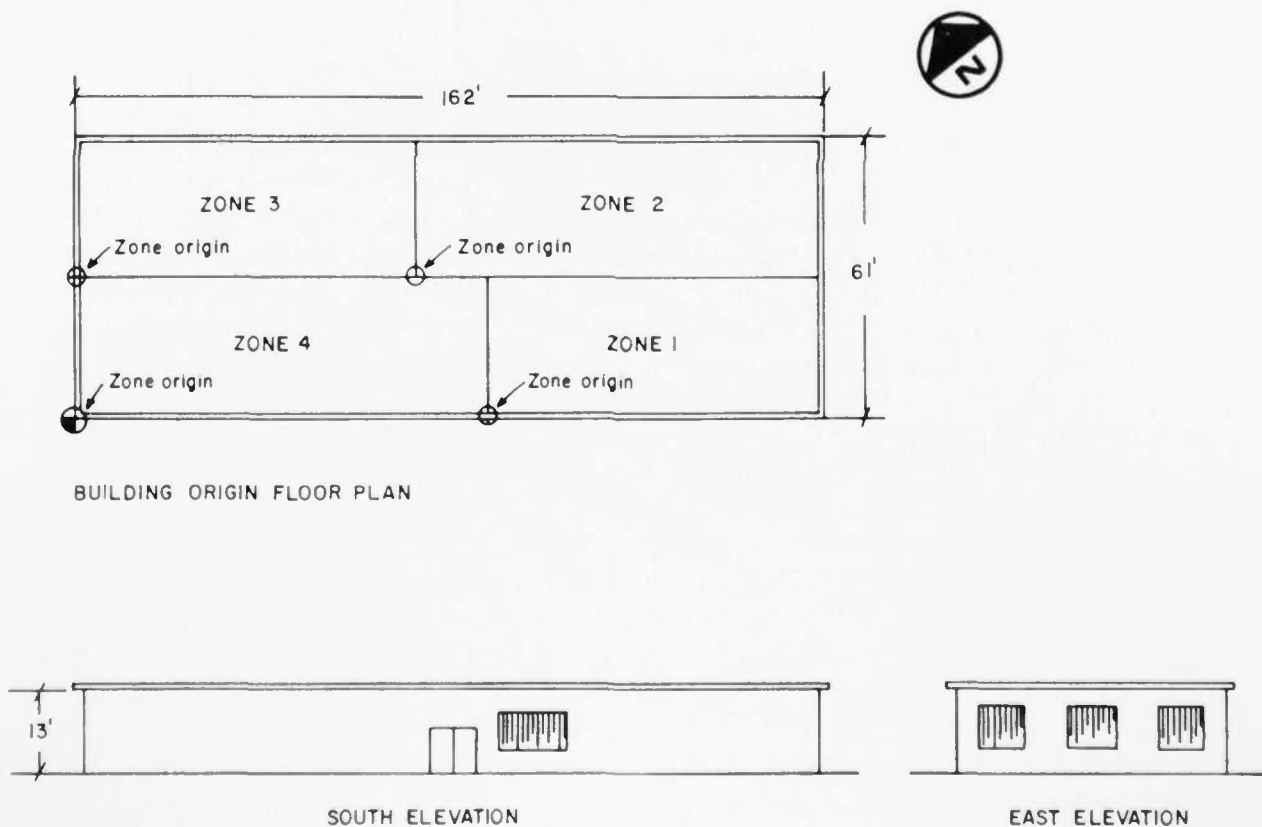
Floor plan, elevations, zone boundaries and selected zone origins for laboratory building Tyndall AFB.
